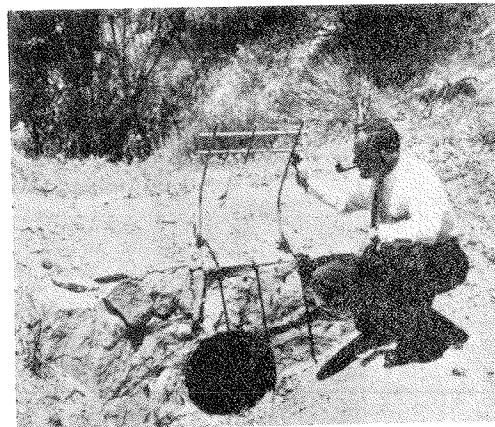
Debris control hinged installation of reinforcing steel at inlet to roadside down-drain.
